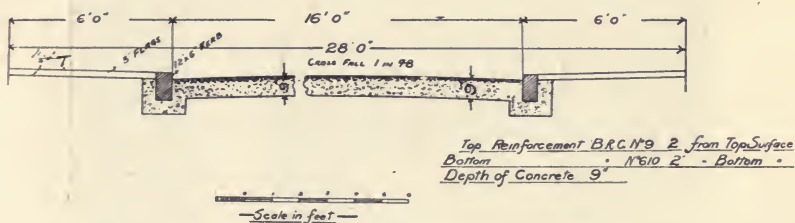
Transverse section of the concrete road laid in New King Street, Deptford, showing the kerbs embedded in concrete.
